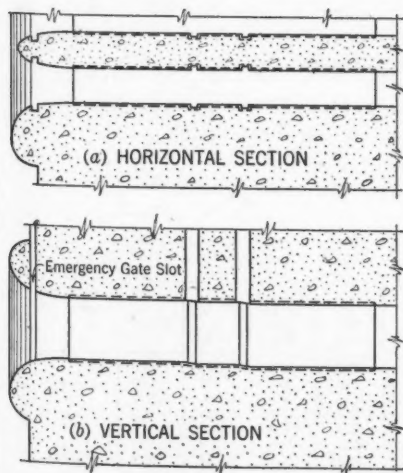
SECTIONS THROUGH SLUICE ENTRANCES, NORRIS DAM
